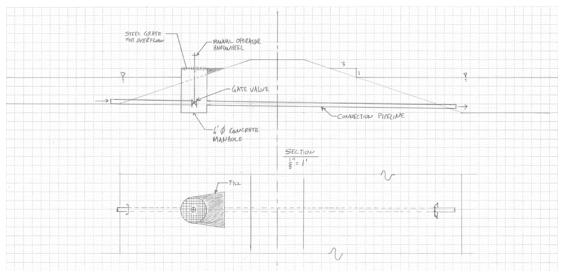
Typical Gate Valve Cross Section and Plan View for Storage Ponds
